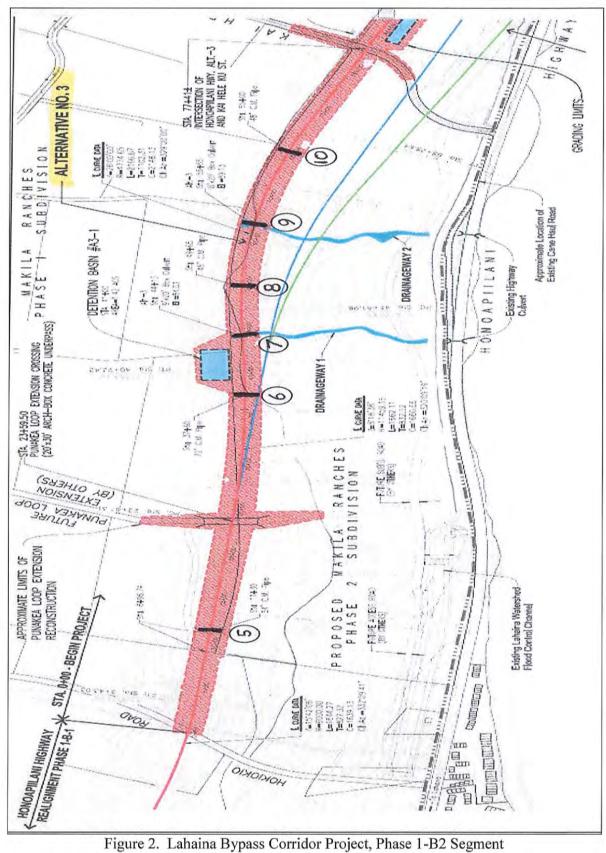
Lahaina Bypass Corridor Project, Phase 1-B2 Segment Drainage Engineering Plan - Northern Half
